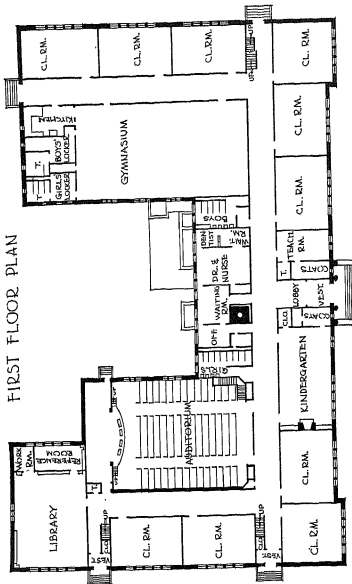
FIRST FLOOR PLAN, PARLEY COBURN SCHOOL, ELMIRA, NEW YORK.
